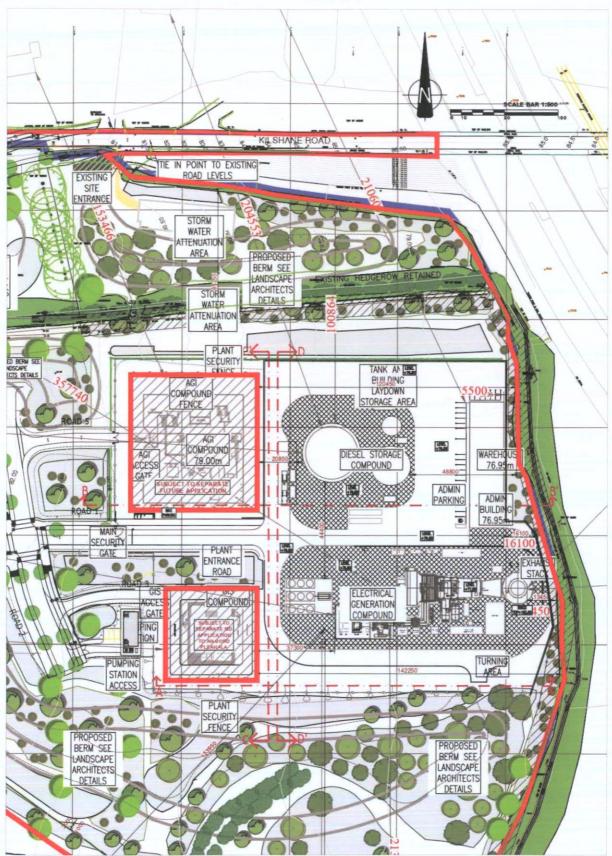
Proposed site plan part 2 (see drawing set for full resolution version)
